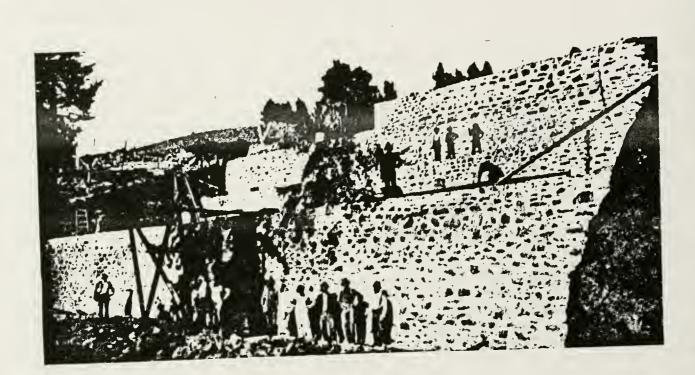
Revenue Mill under construction, 1899, stone foundation. (photograph courtesy of Bill and Doris Whithorn, Park County Museum, Livingston, Montana)
